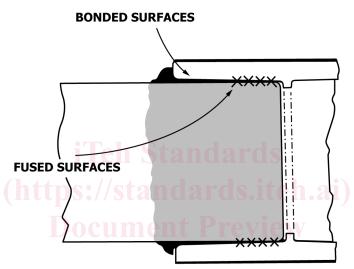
Bonded and Fused Surfaces of Joined Pipe
